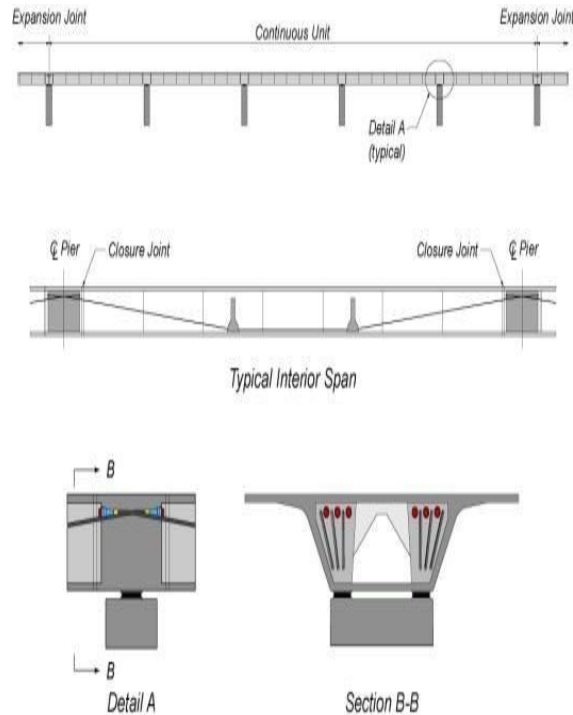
Interior Span Post-Tensioning for Span-By-Span Construction.
